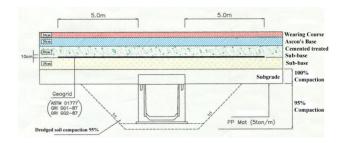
Cross section of geogrid reinforced asphalt pavement
